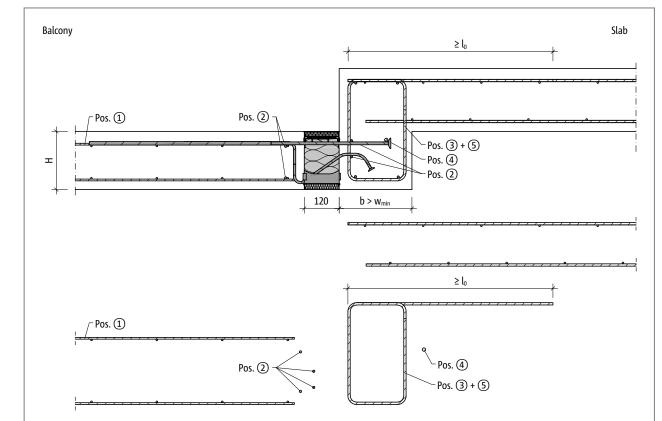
Schöck Isokorb[®] XT type K-U: On-site reinforcement for balcony with height offset downwards with larger structural element dimension ($w_{vorh} > w_{min}$)
